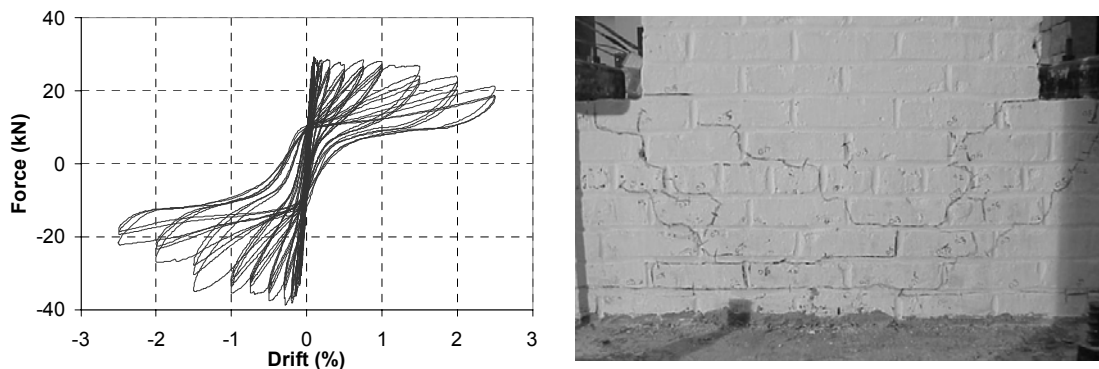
Force-drift plot and final damage photo for reinforced core rehabilitated pier
